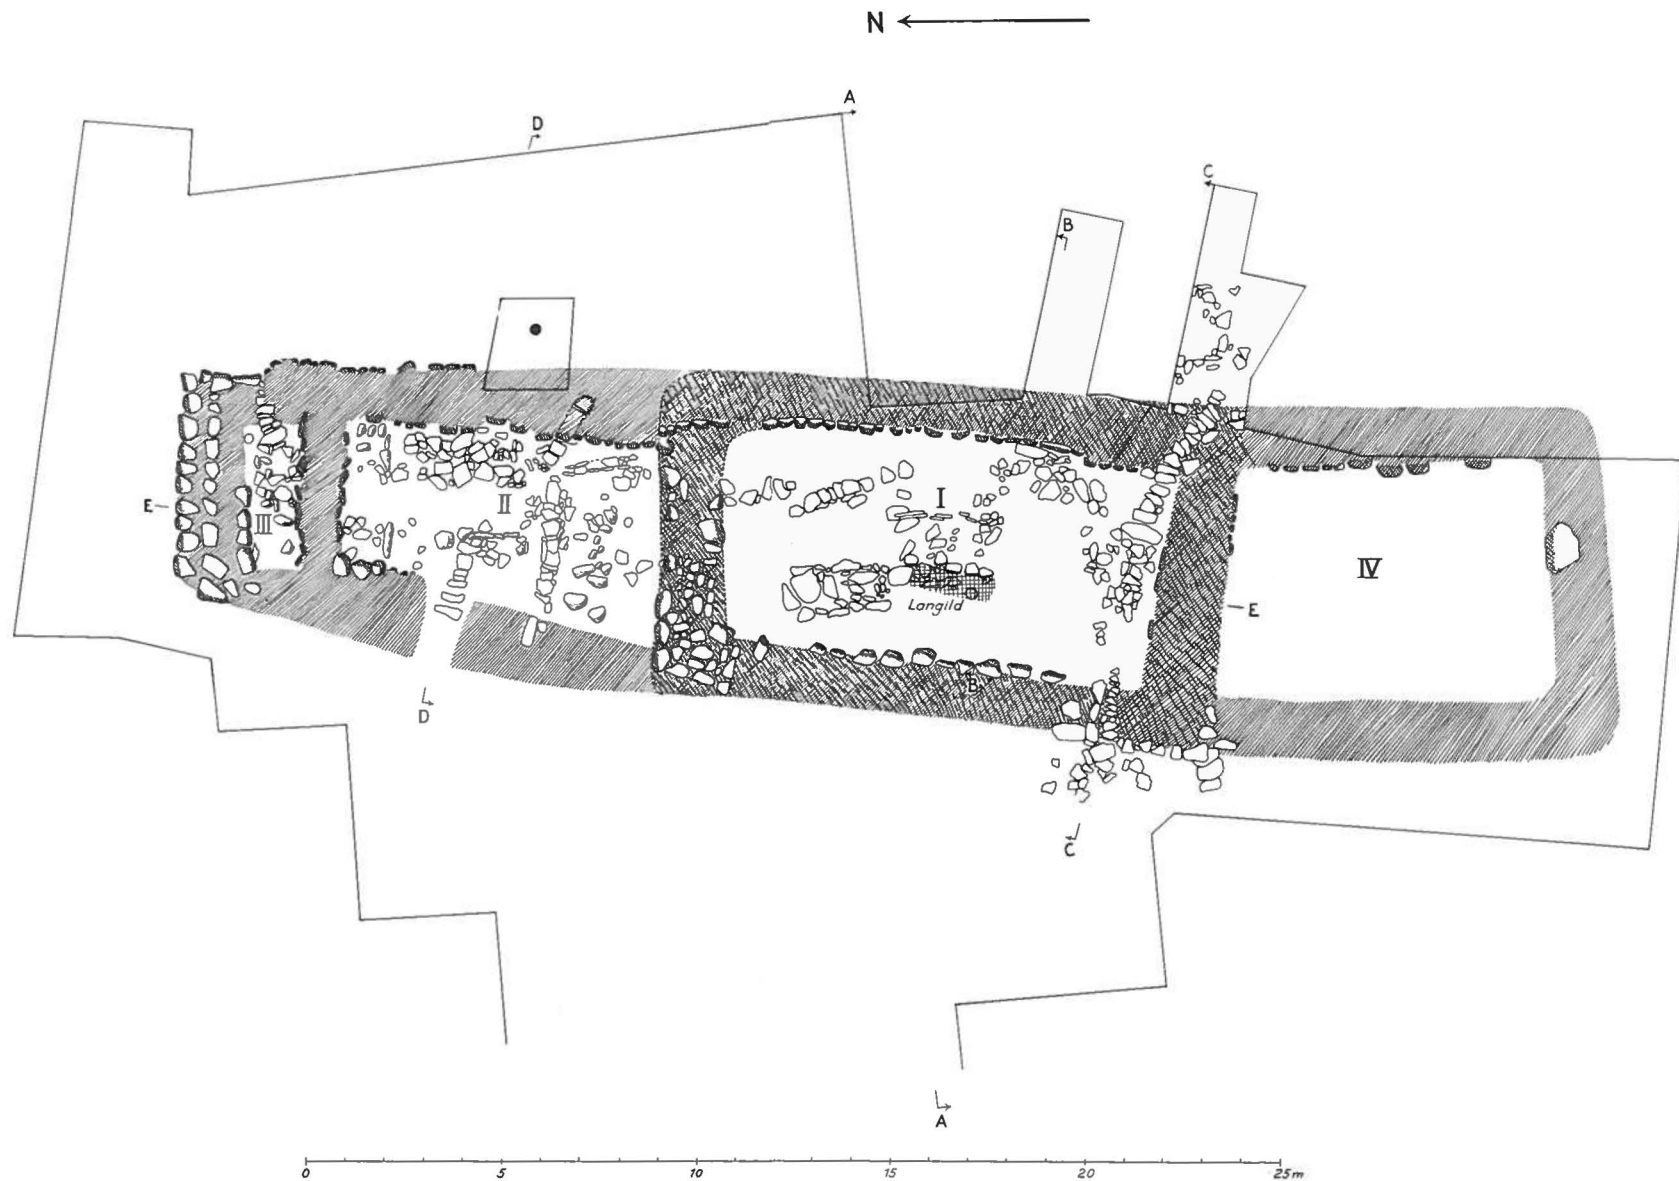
Plan B (drawing) of the dwelling (a slightly later stage than plan A) (C. L. Vebæk, *del.*, 1954, 1958 and 1962).
